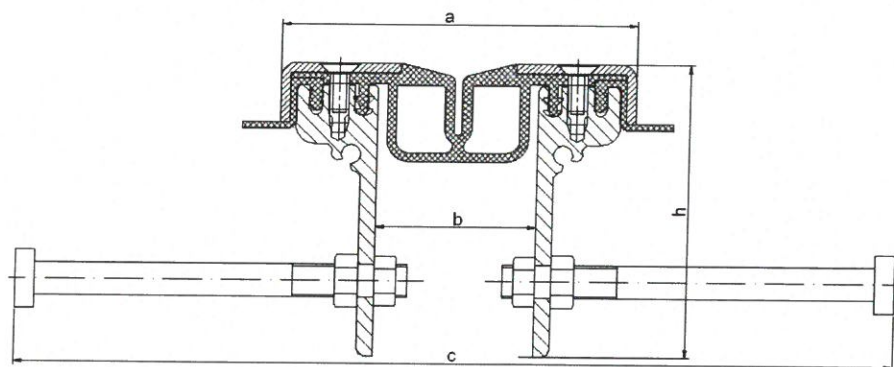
CONECTO PARK GA 88.45.90& S waterproof expansion joint profile
